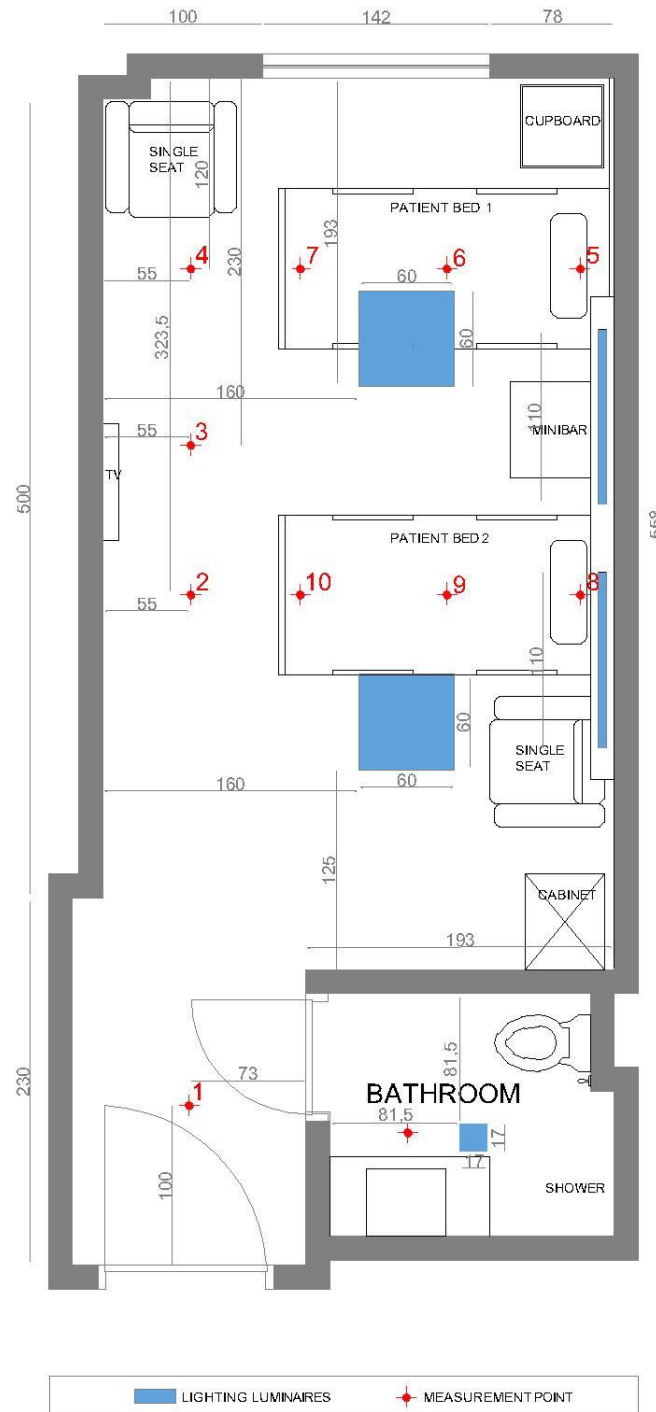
Private Ege Yasam Hospital-Room Plan
